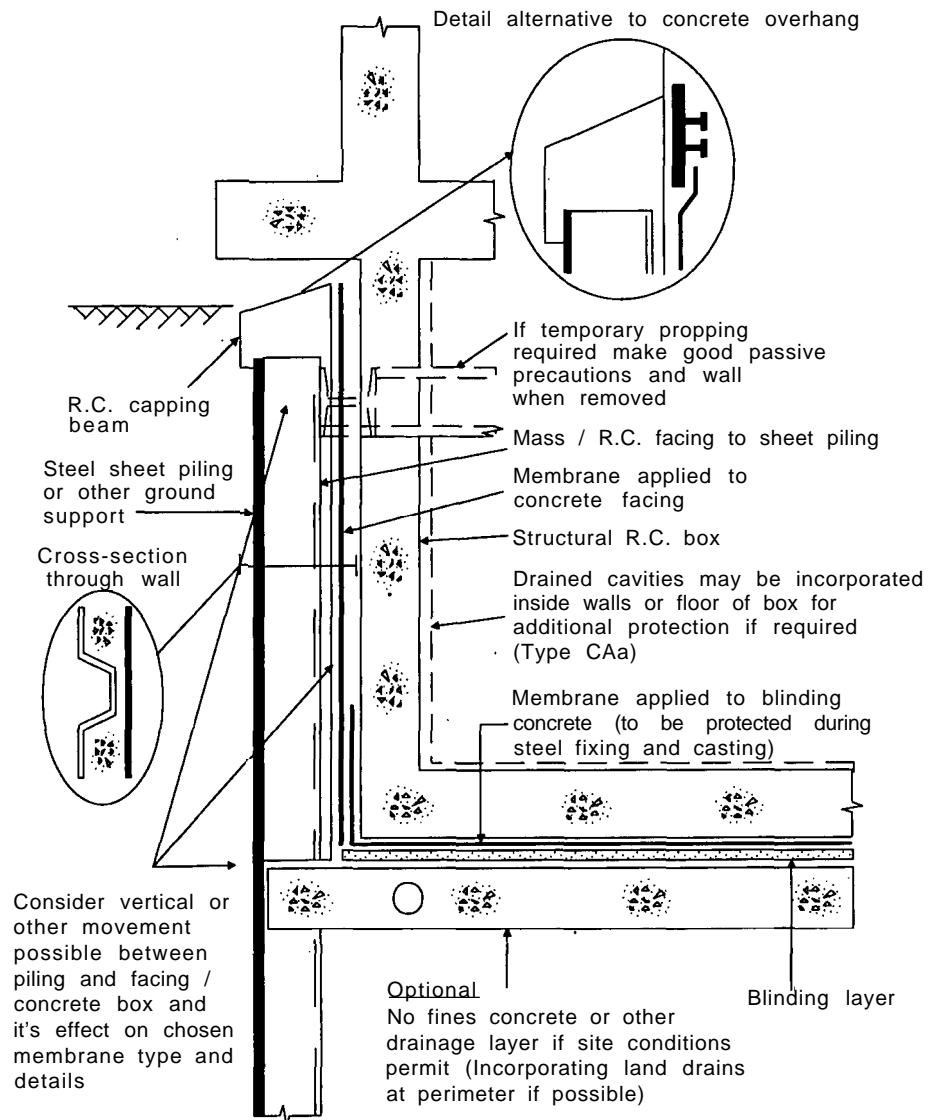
Example of external tanking applied to inner face of sheet piling (reverse tanking) (Type Ae<sub>r</sub>)
